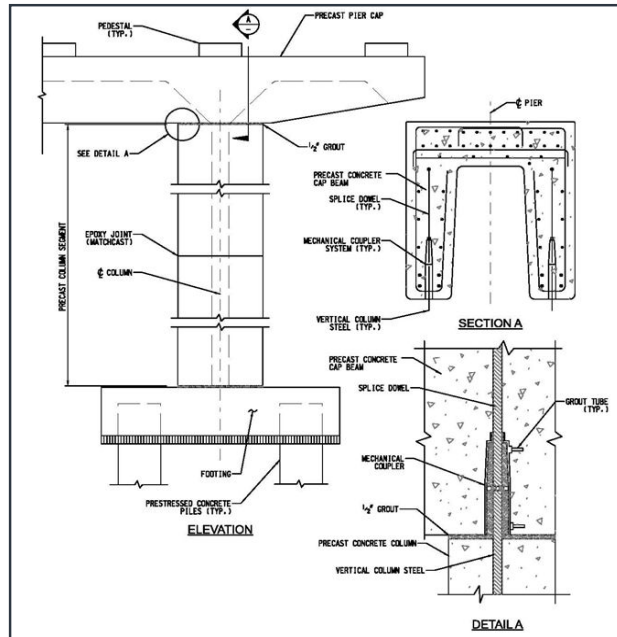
Precast column pier cap connection with grouted coupler in Florida
